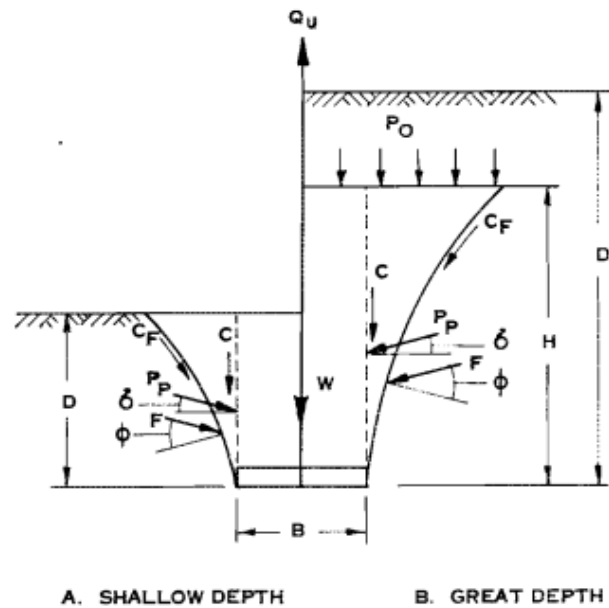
Failure Modes for Shallow and Deep Footings in Uplift (Meyerhof & Adams, 1968).
